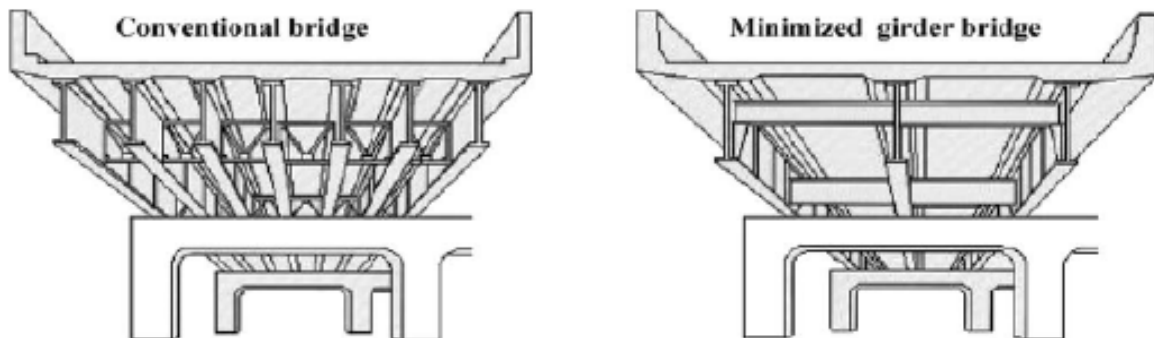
a) Conventional bridge and b) minimized girder bridge (Itoh et al., 2003)
